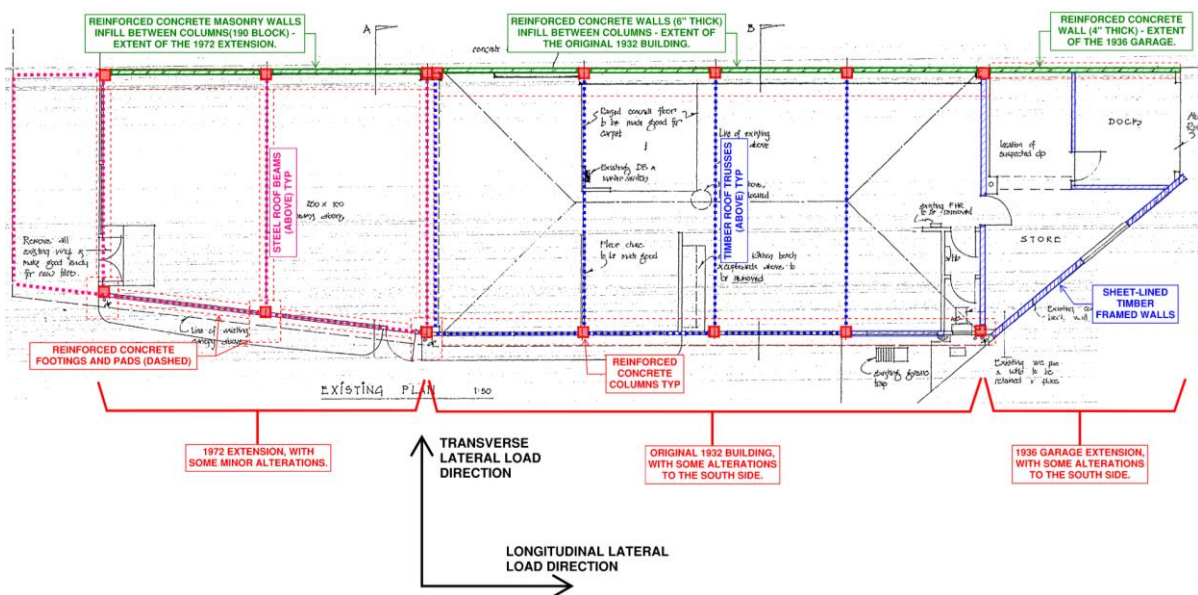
Floor plan of the building, showing the various alterations / extensions over time.
